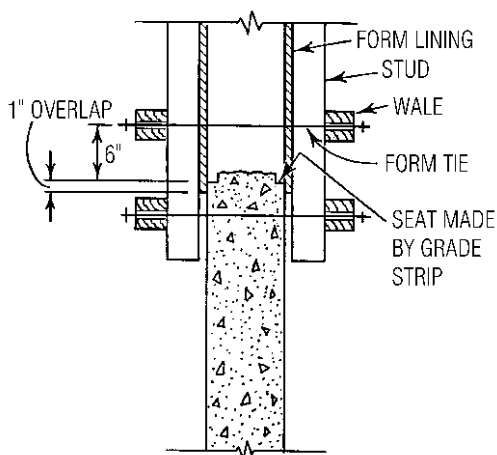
Form set to avoid bulges at a horizontal joint in a concrete wall.
